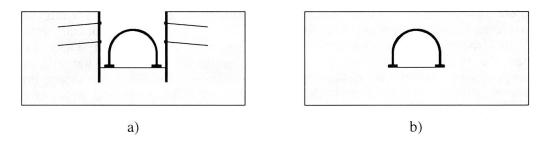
Cut-and-cover tunnel in an excavation supported by pile walls
